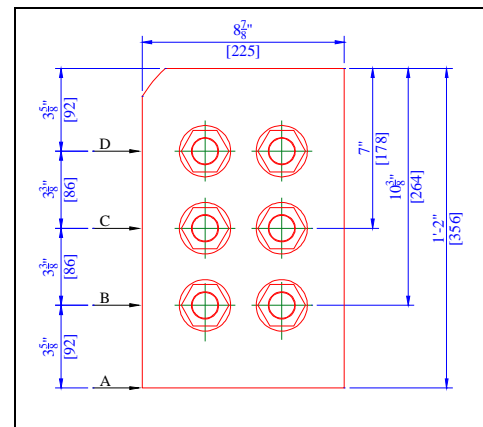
DETAILS OF VERTICAL FACE PLATE BOLTS
